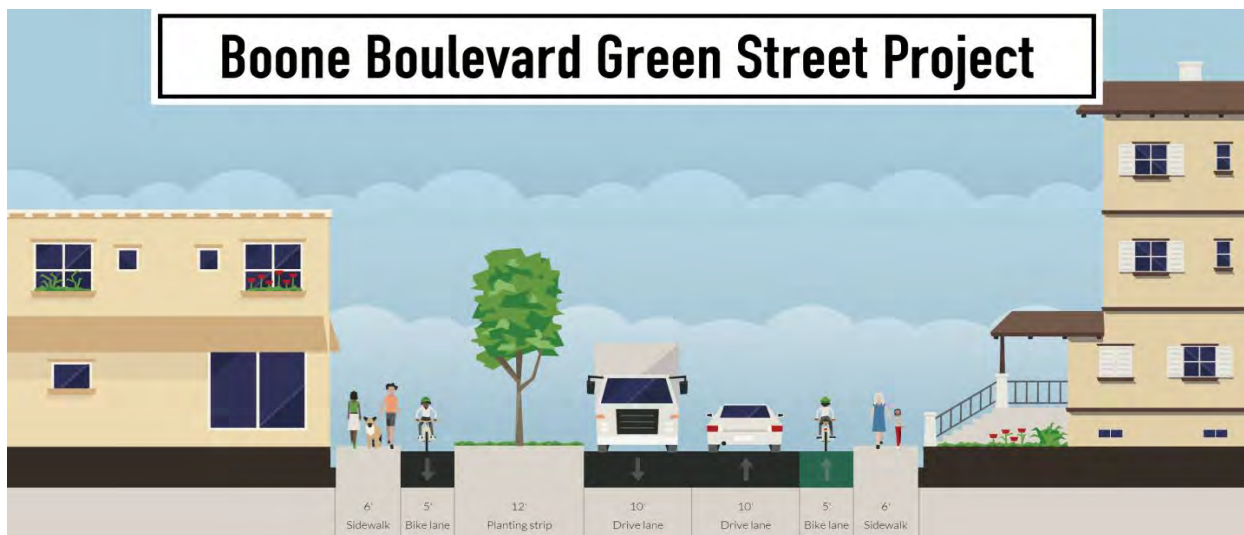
Cross-section of Boone Street if DWM implements the proposed project as planned. (Source: www.streetmix.net 2013)
